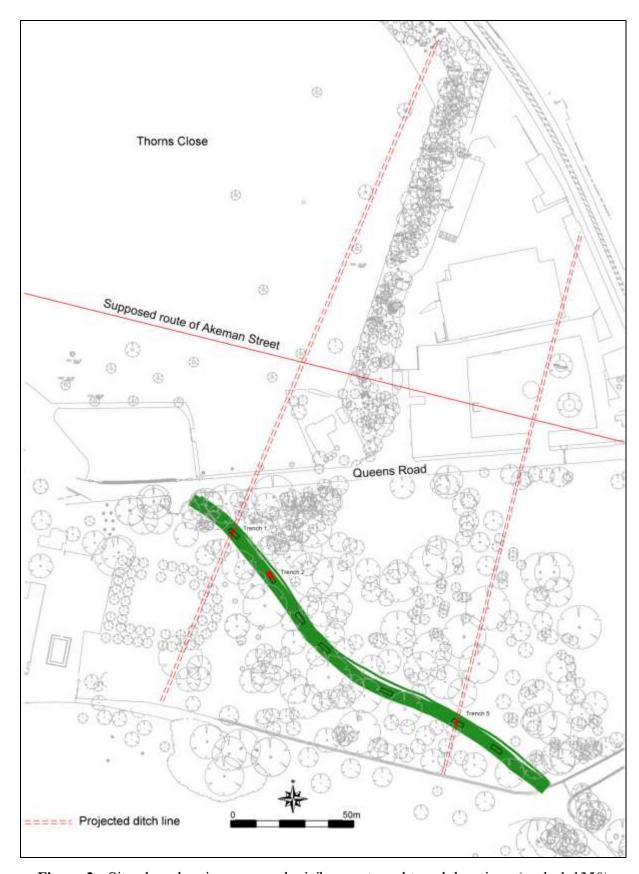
Site plan, showing proposed minibus route and trench locations (scale 1:1250)
